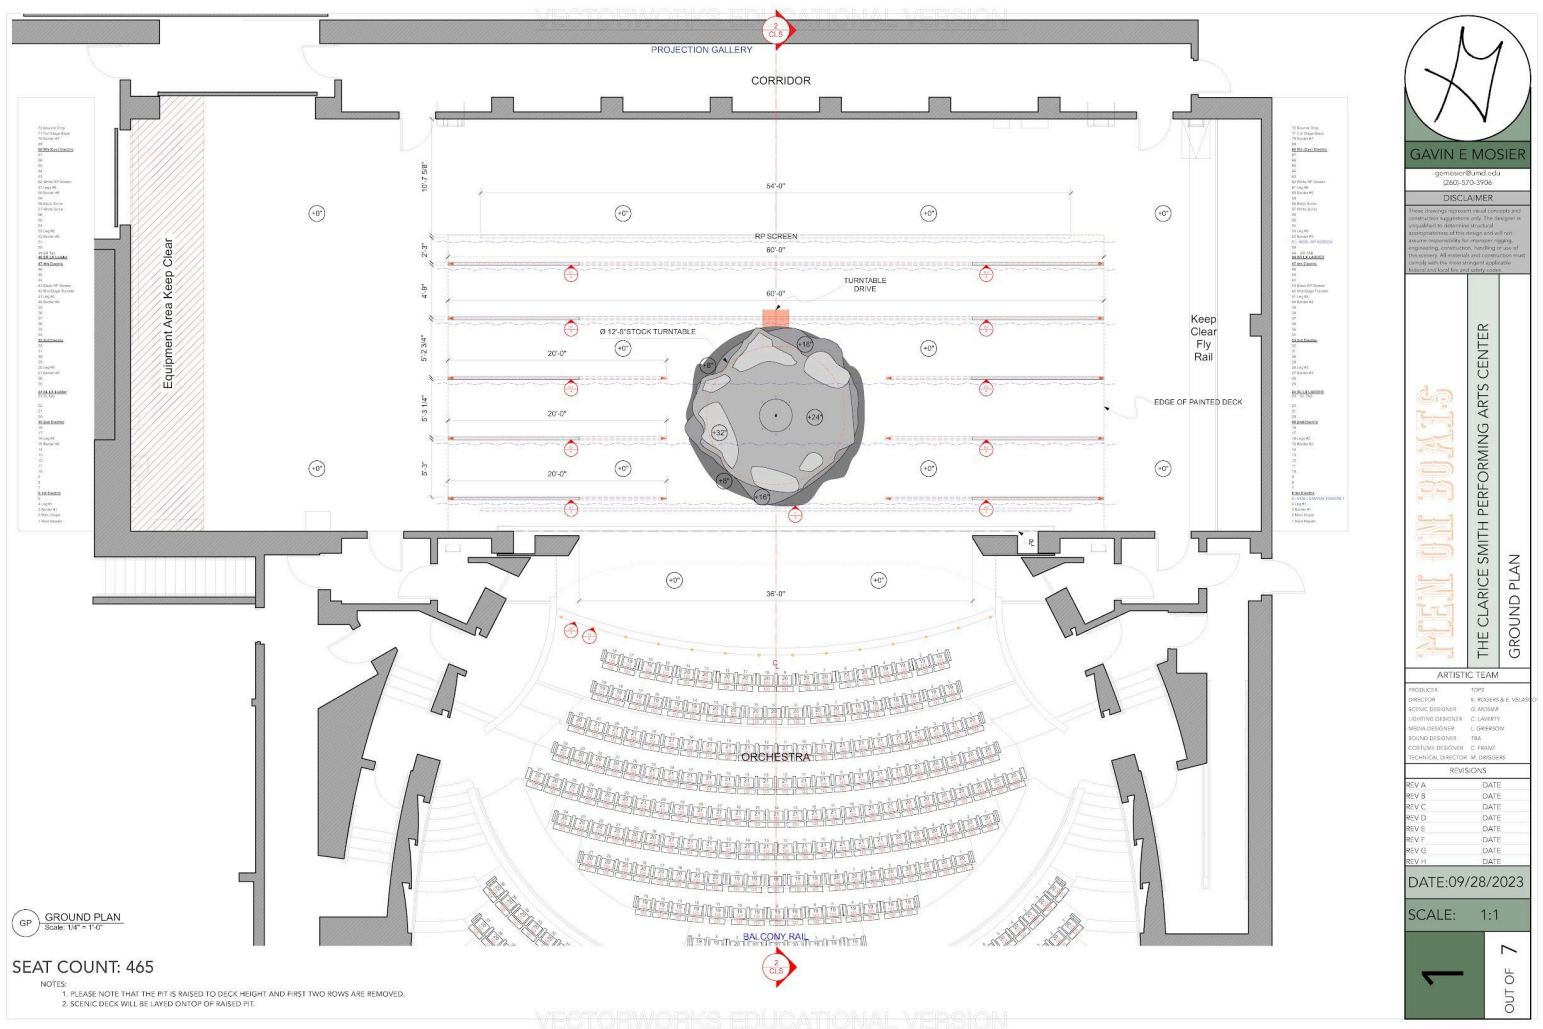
Drafting - preliminary ground plan. Drafting out of scale.
